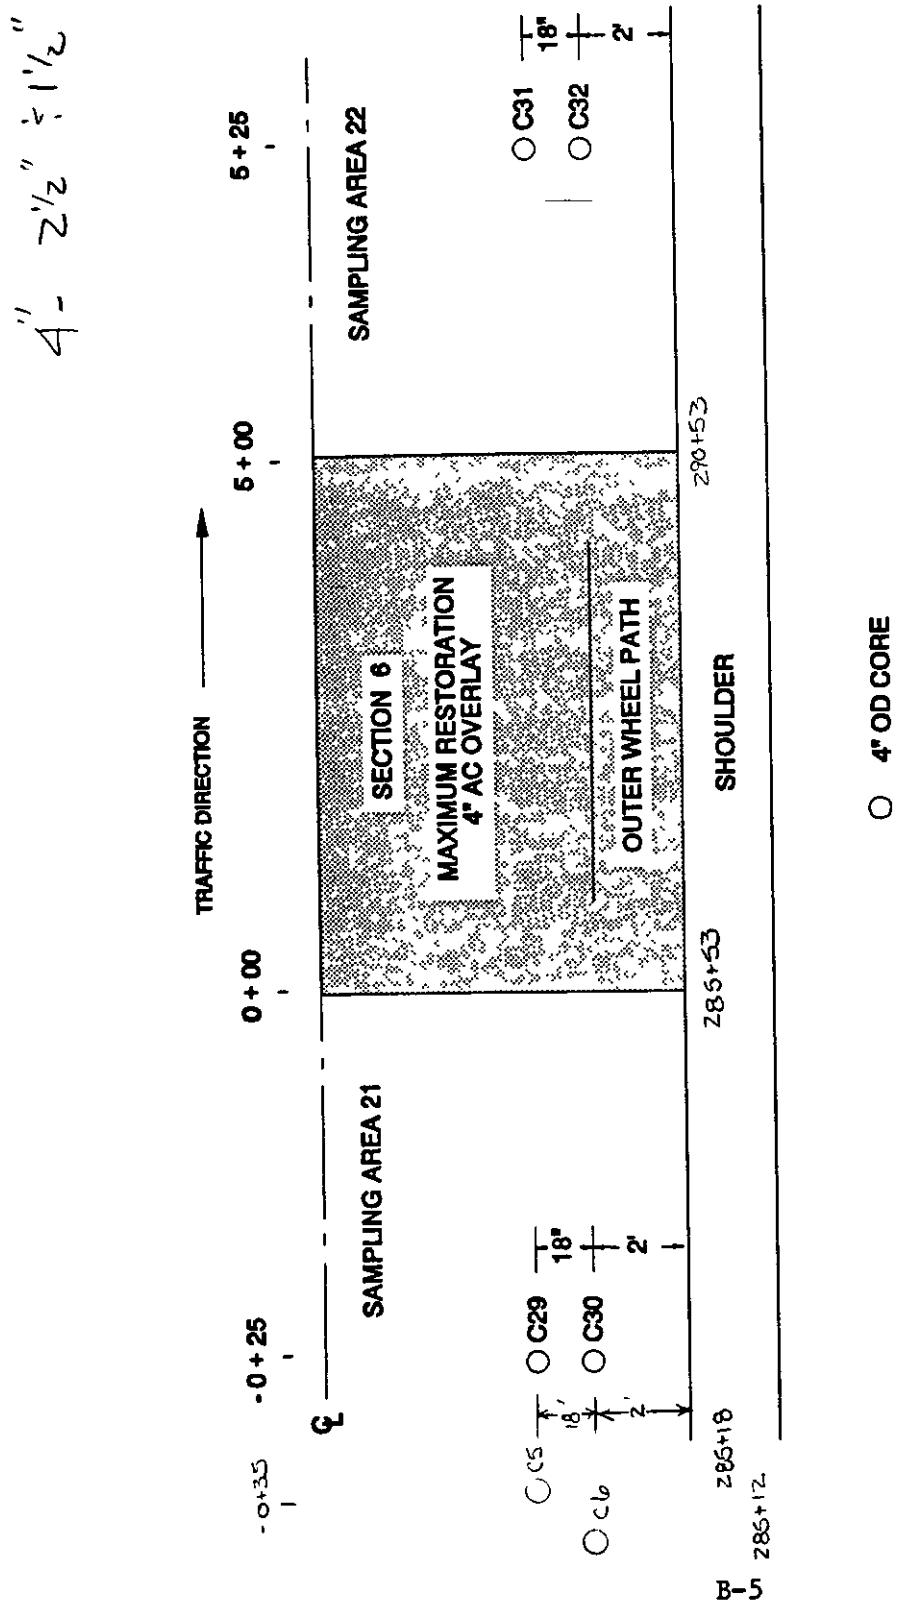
Example of "Post-Construction" Sampling Plan for Test Section 6
